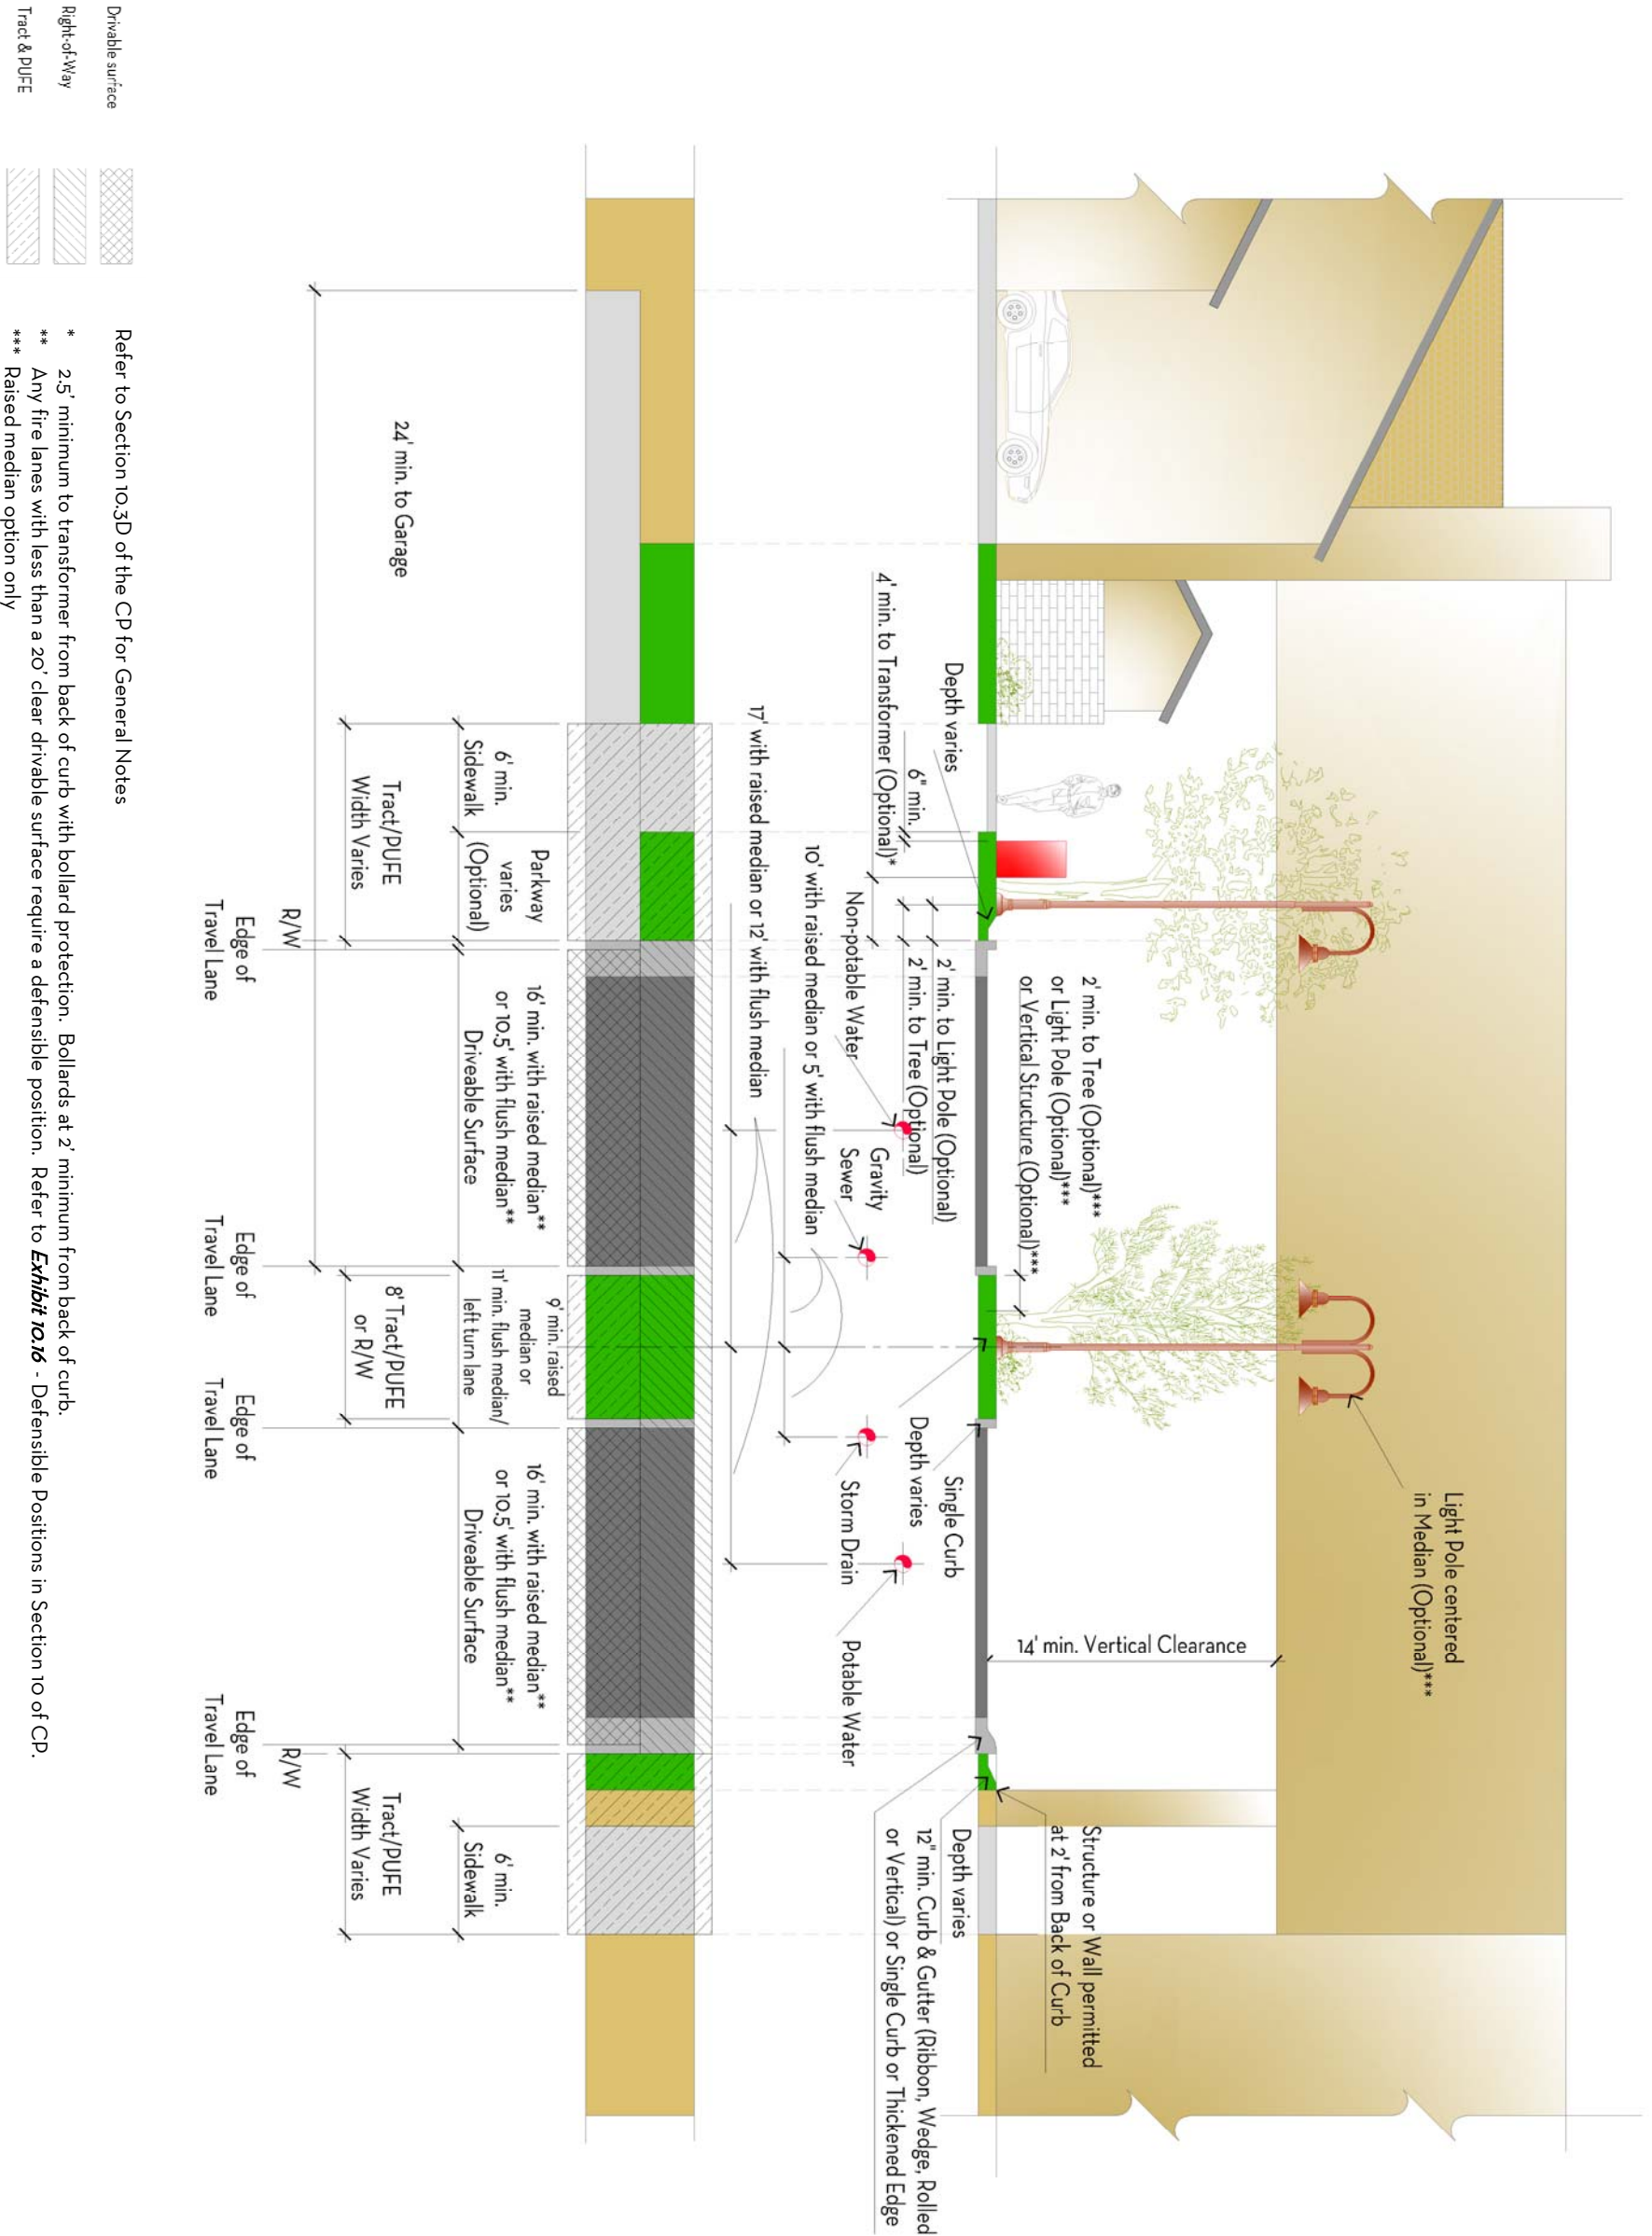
Two-Way Two Lane District Street - Detailed Cross Section
